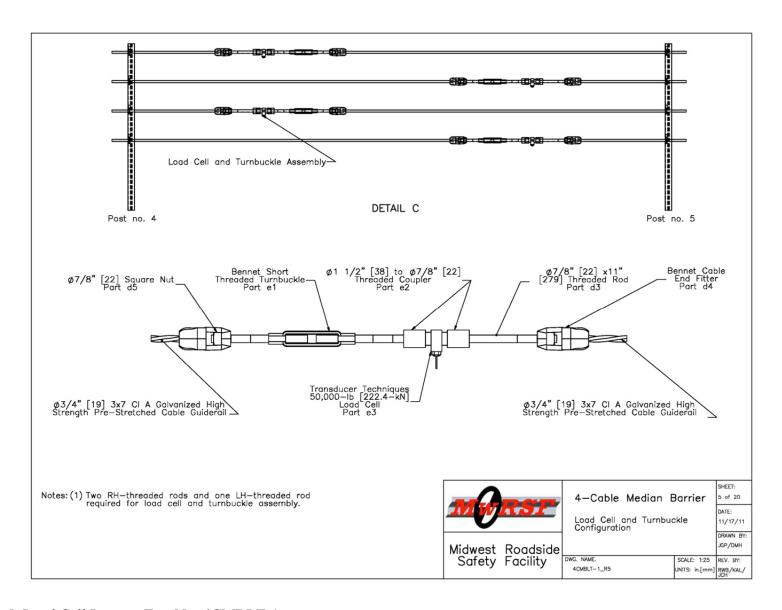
Load Cell Layout, Test No. 4CMBLT-1
